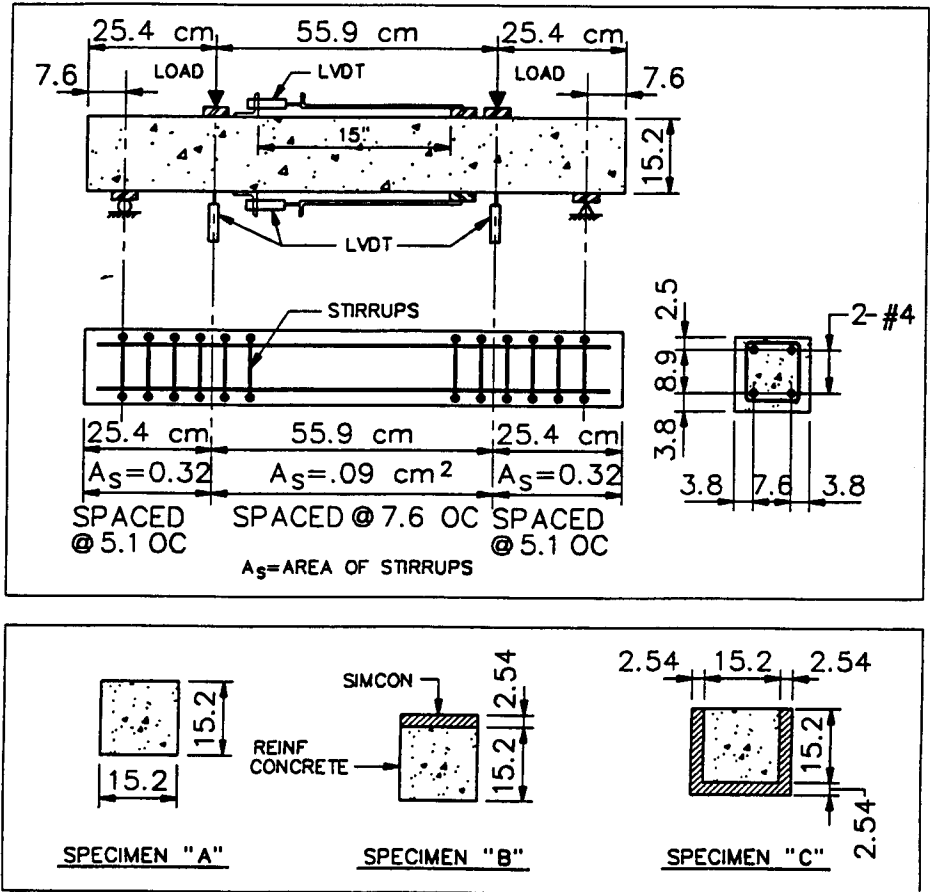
Layout of the reinforced beams tested using SIMCON.
